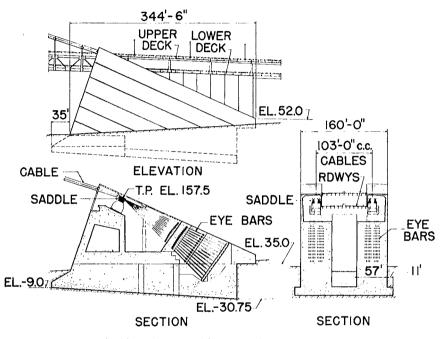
General details Brooklyn anchorage Verrazano Narrows Bridge, Brooklyn, N.Y.
